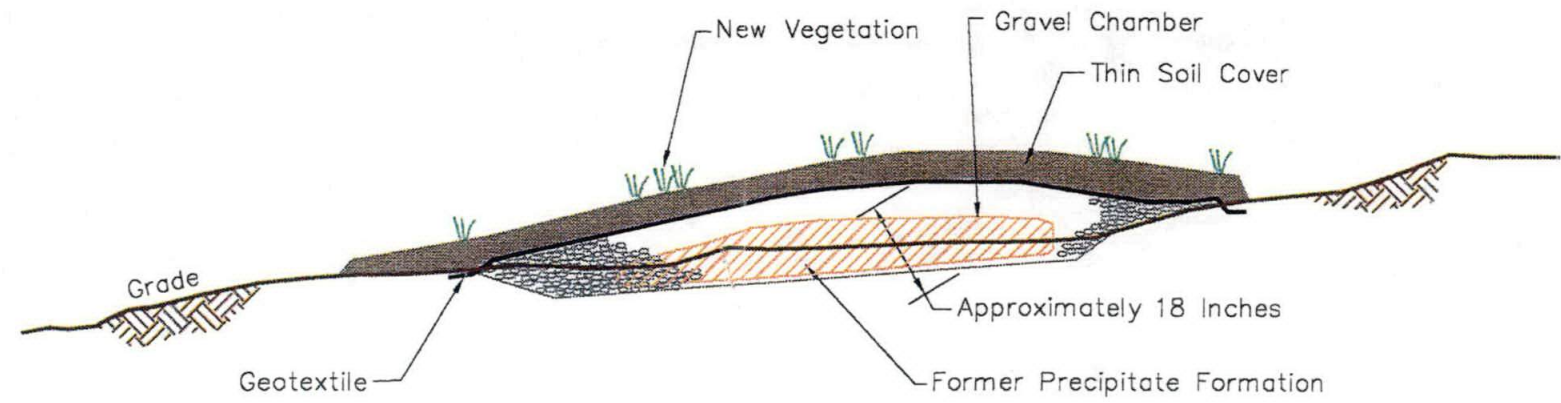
Typical Topsoil and Hydroseed Slope Protection
